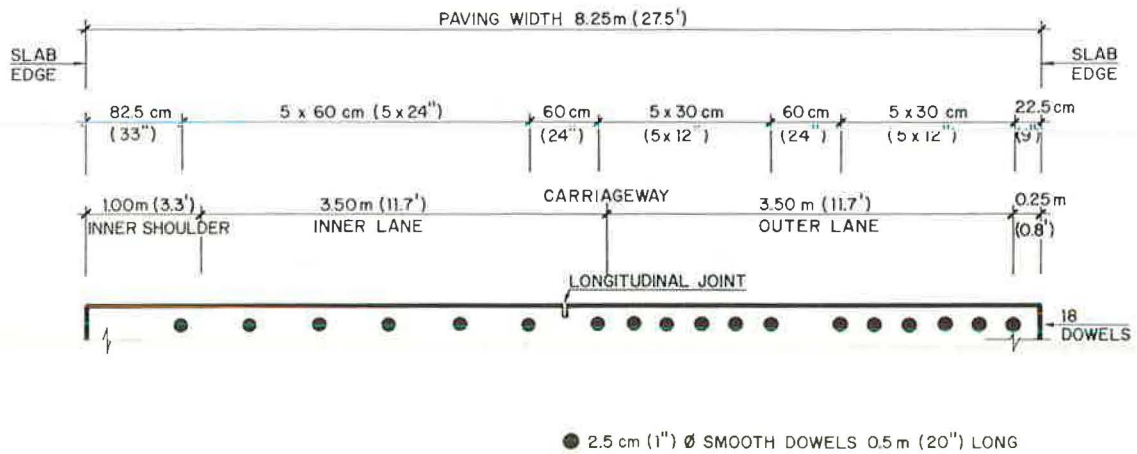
Dowel distribution at joints of concrete pavements (7).
